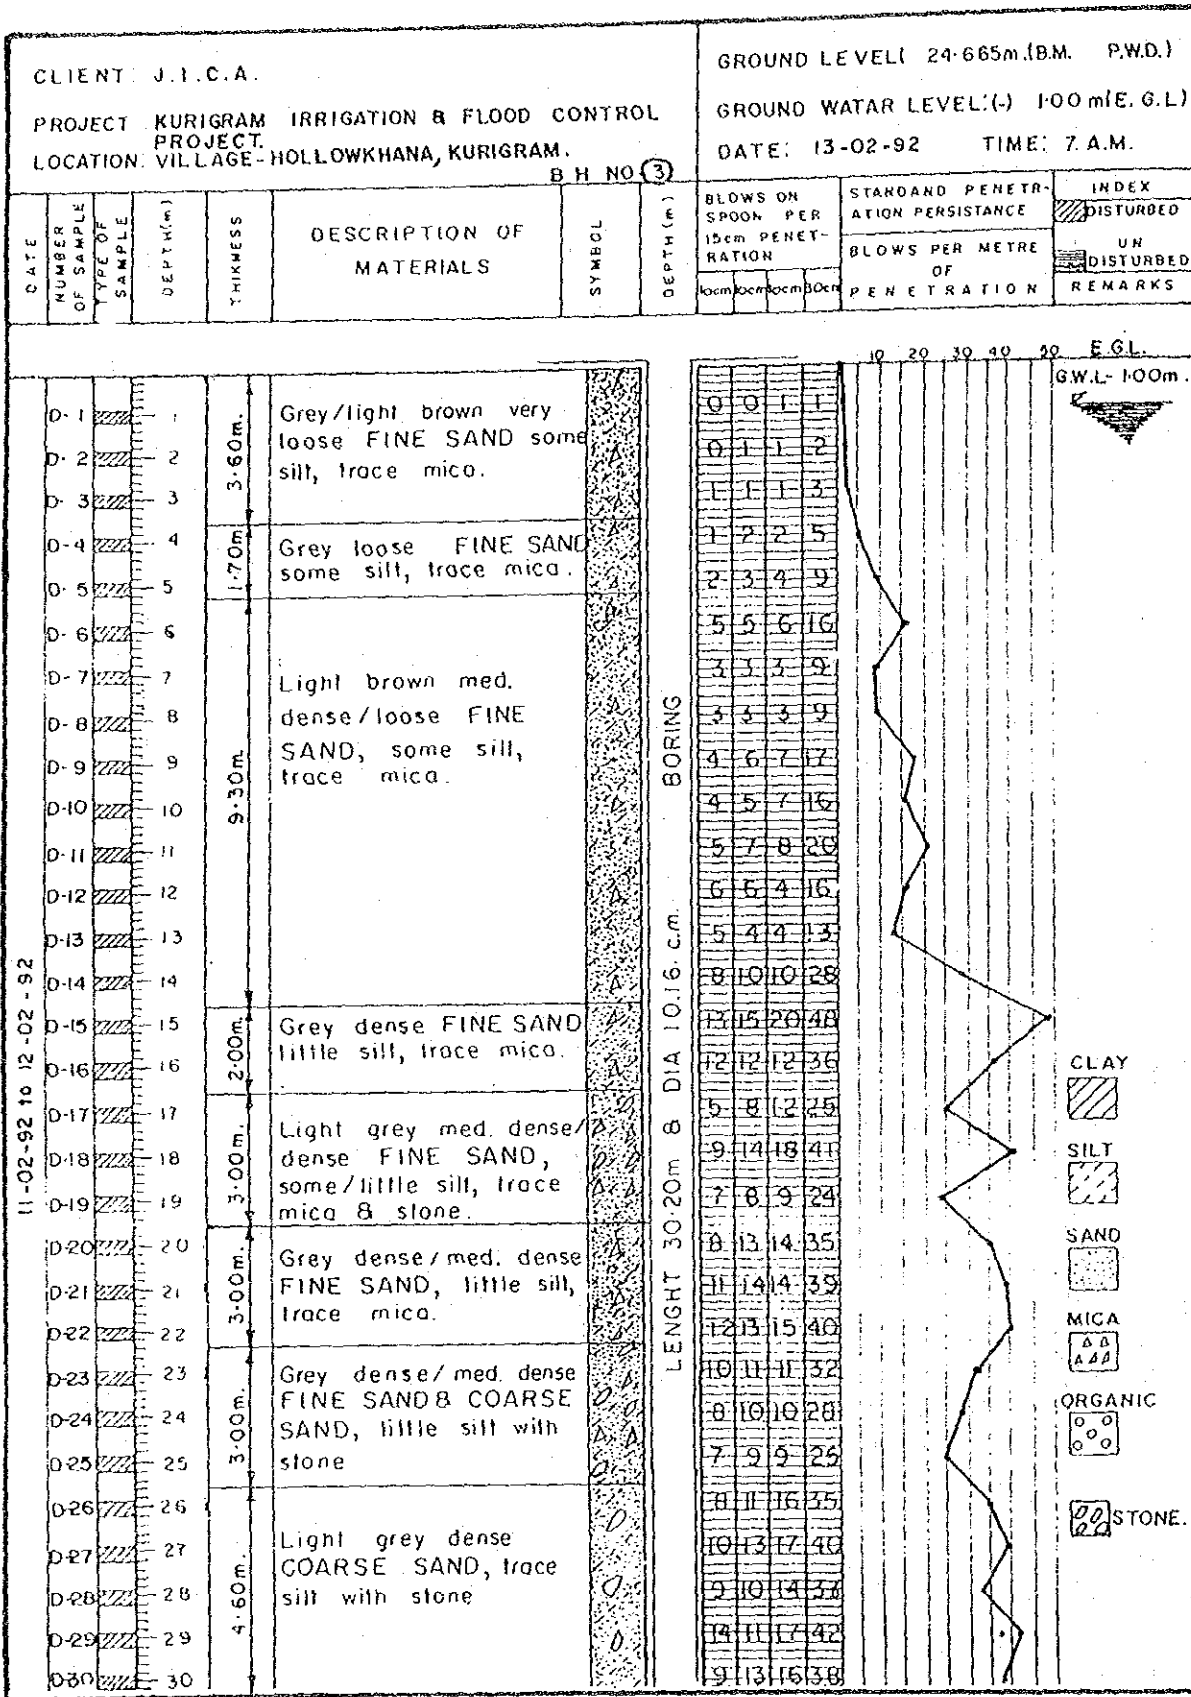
PROPOSED PUMPING STATION SITE (5/8)
